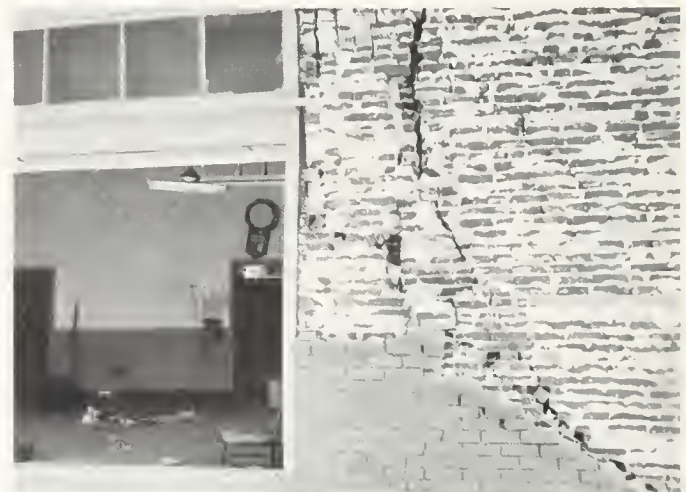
Detail of damaged brick building in business district of Tehachapi. Same building is shown at left in figure 5.
